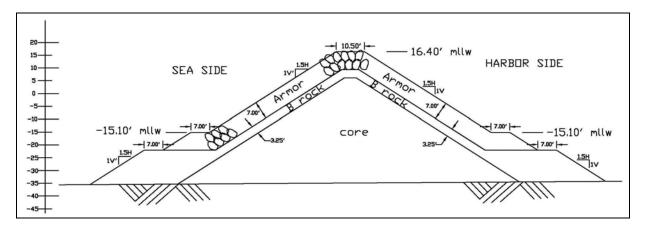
Main Breakwater Extension and North Breakwater Extension Cross Section - Alternative 15.
